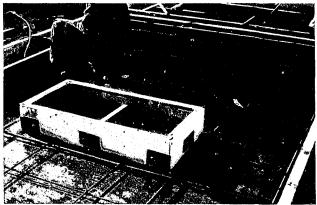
Cell front mold with door frames installed. A blockout for the cell chase door is in the center.
